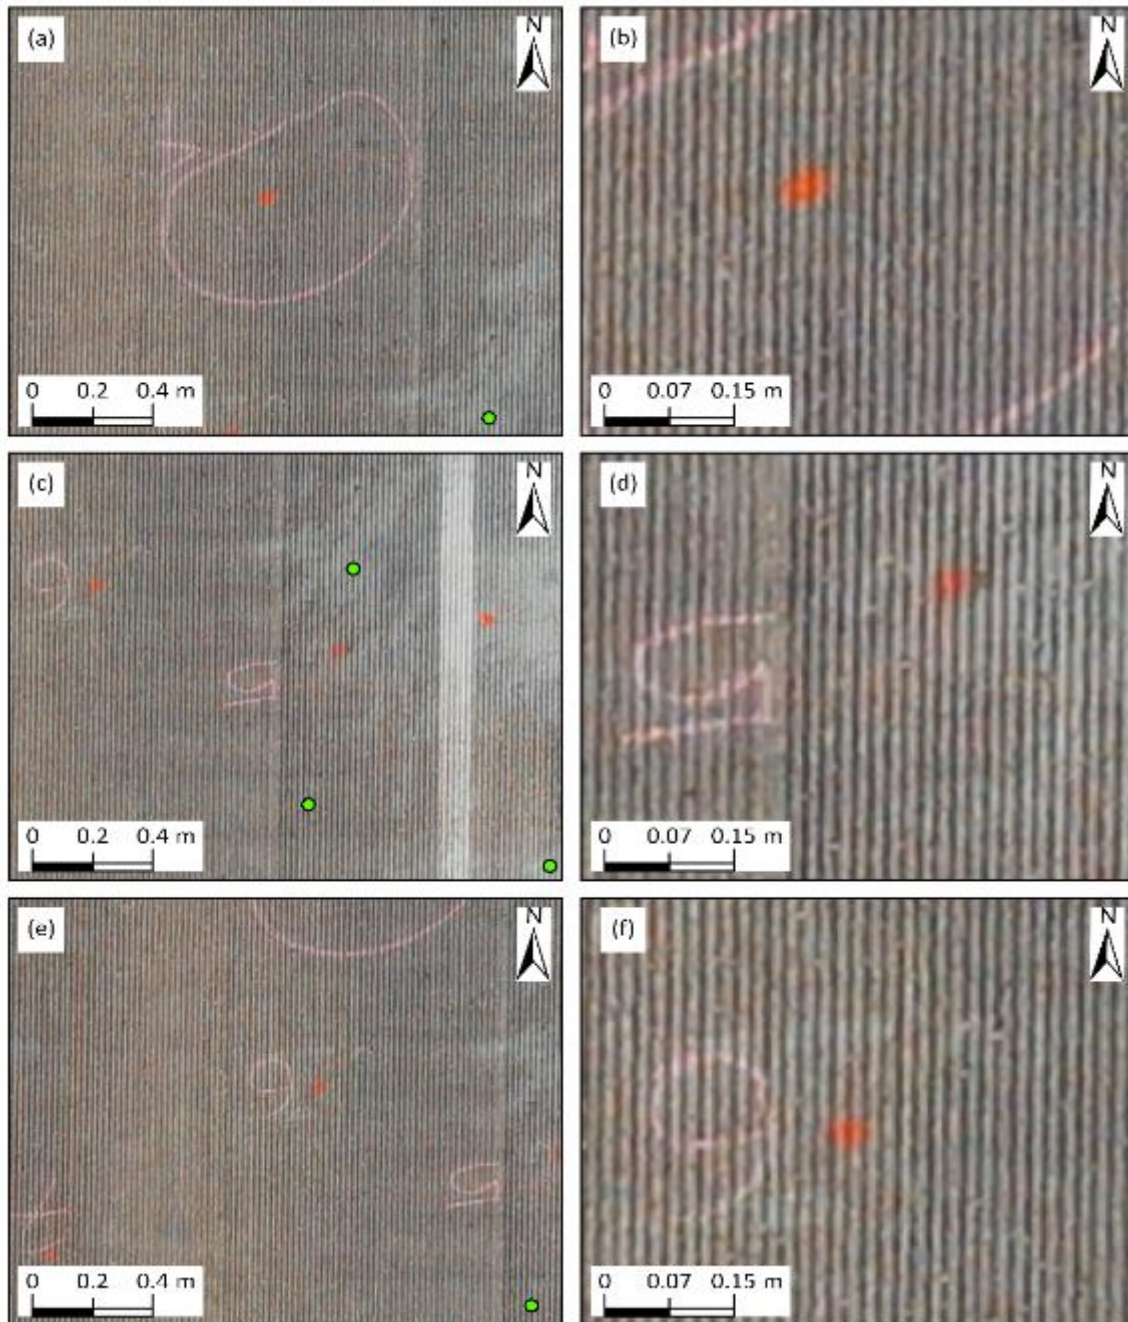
Cracks 4 through 6 at 0.079 in. (2.02 mm) GSD (1:20 zoom level on left and 1:7 zoom level on right)
